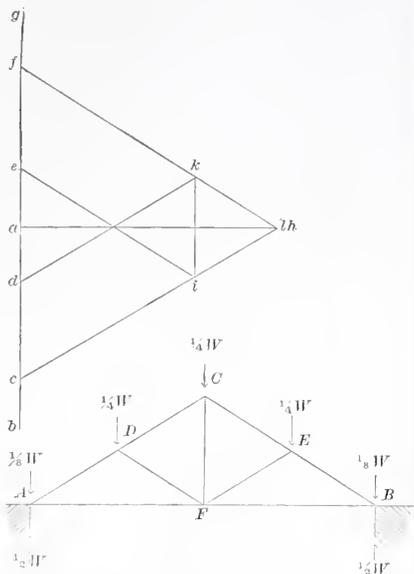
Stress Diagram of Roof Truss of the General Form of A B C F.
